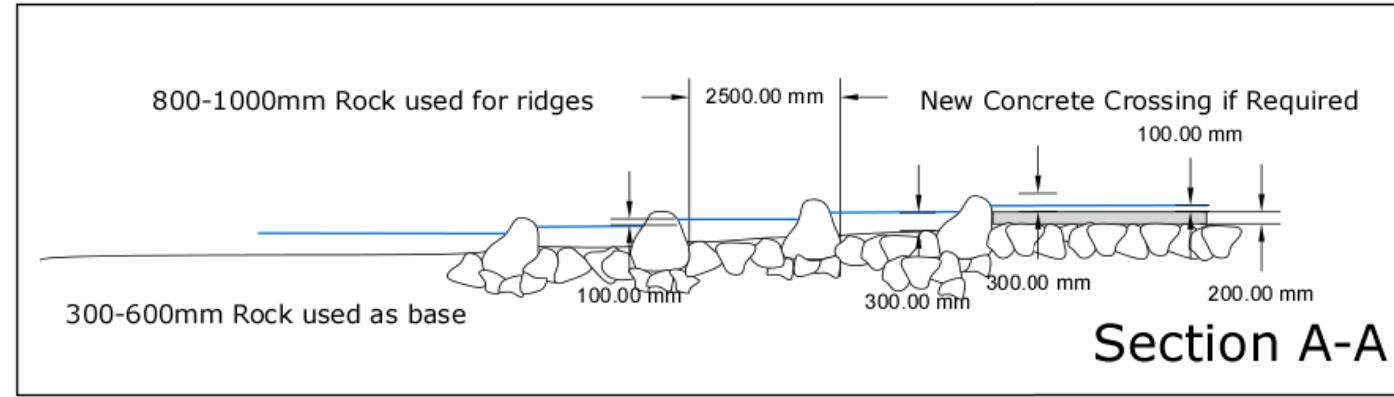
The existing structure at Sheepstation Creek to be removed and a rock ramp fishway to be built.
